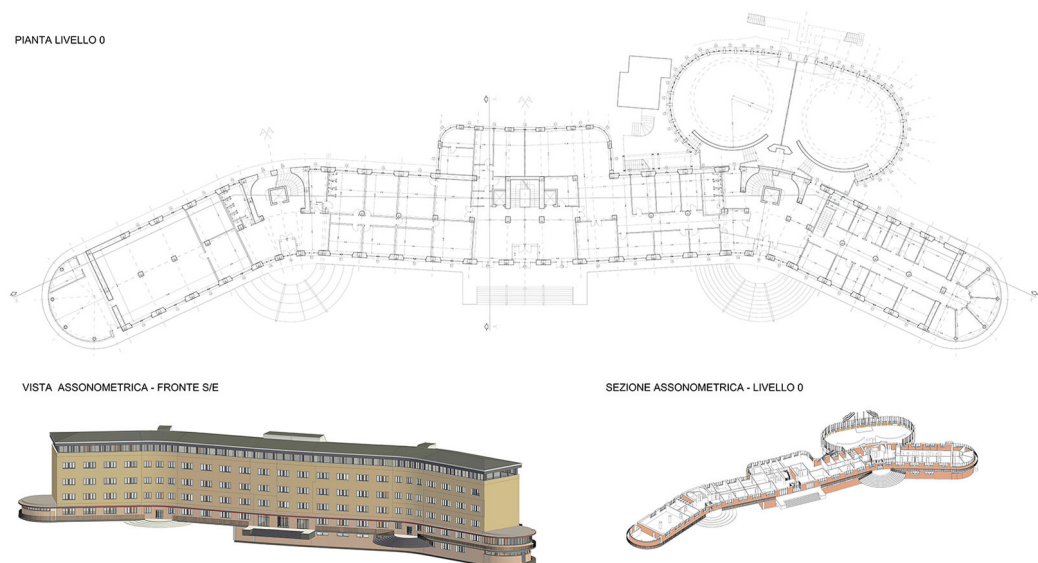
Ground floor plan, model view, axonometric section (elaboration by the authors).
